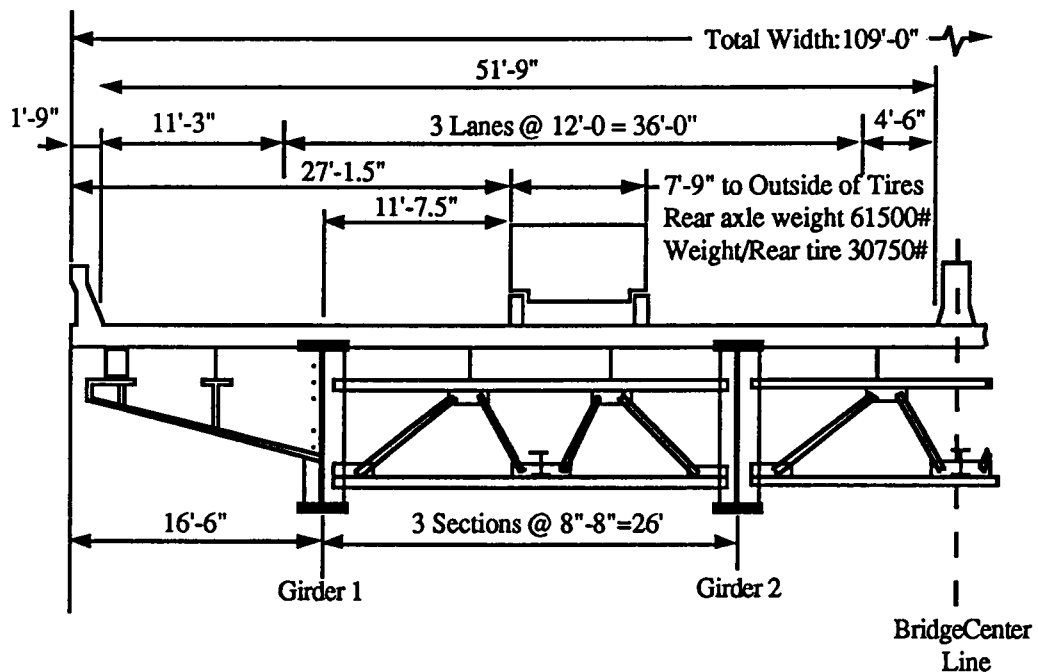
Typical section of bridge at Cross Frame with Truck Location
